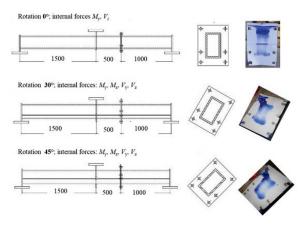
Position of the beam splice joins on beam, inclination and contact imprints.
